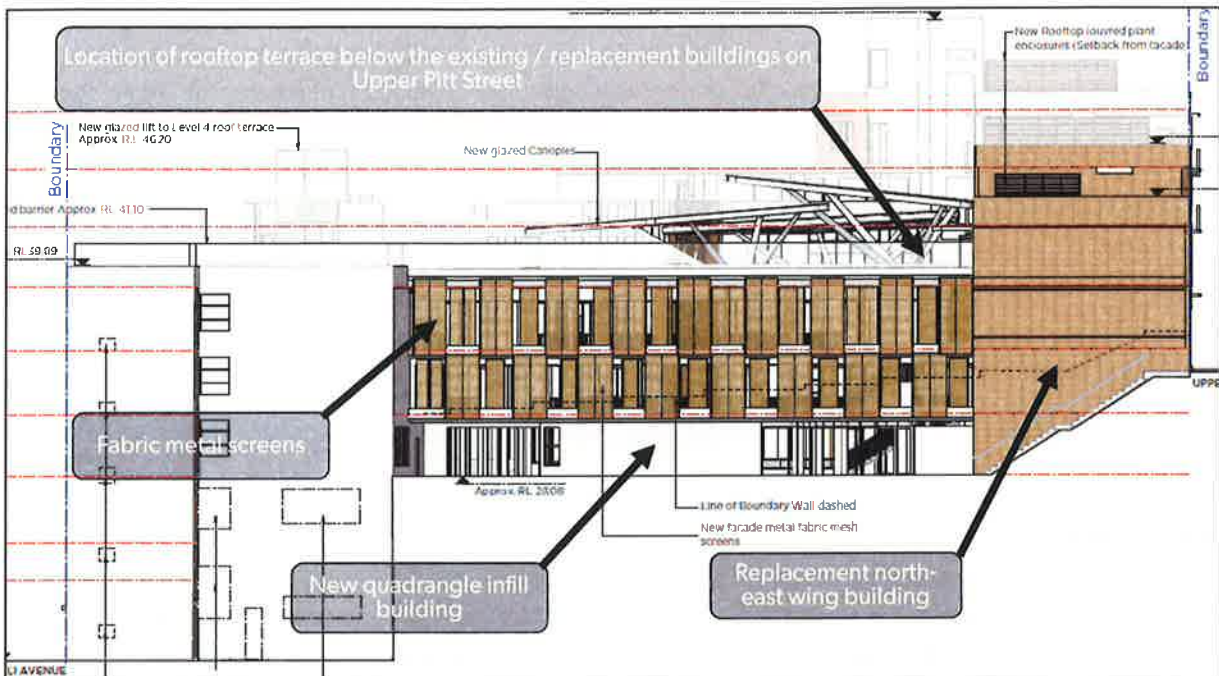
| Eastern elevation of the Main Campus (Source: Applicant's RtS 2018)
